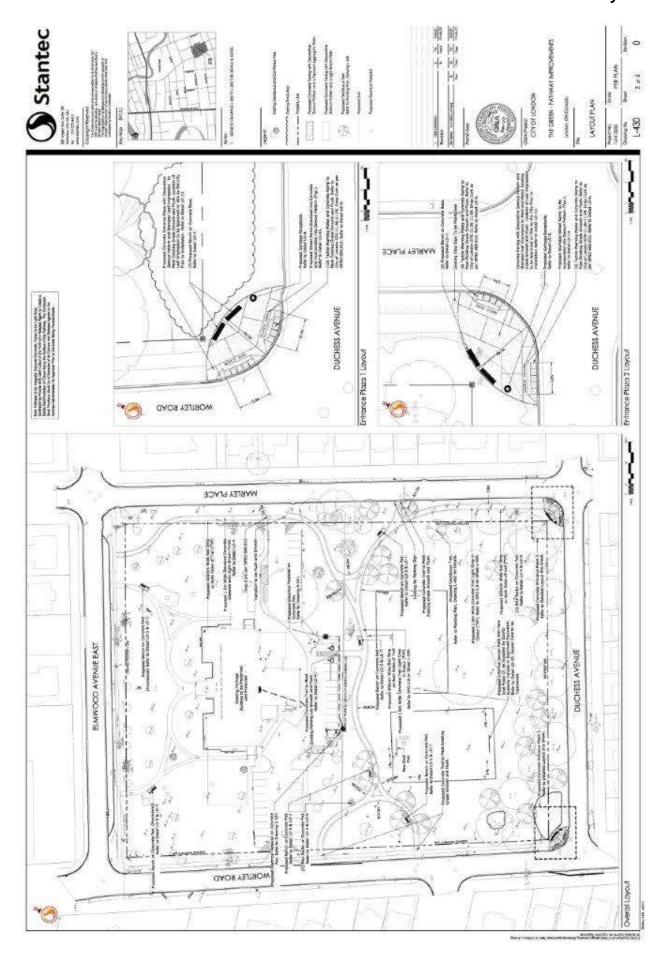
Drawing L-430: Layout Plan (April 2, 2018).
